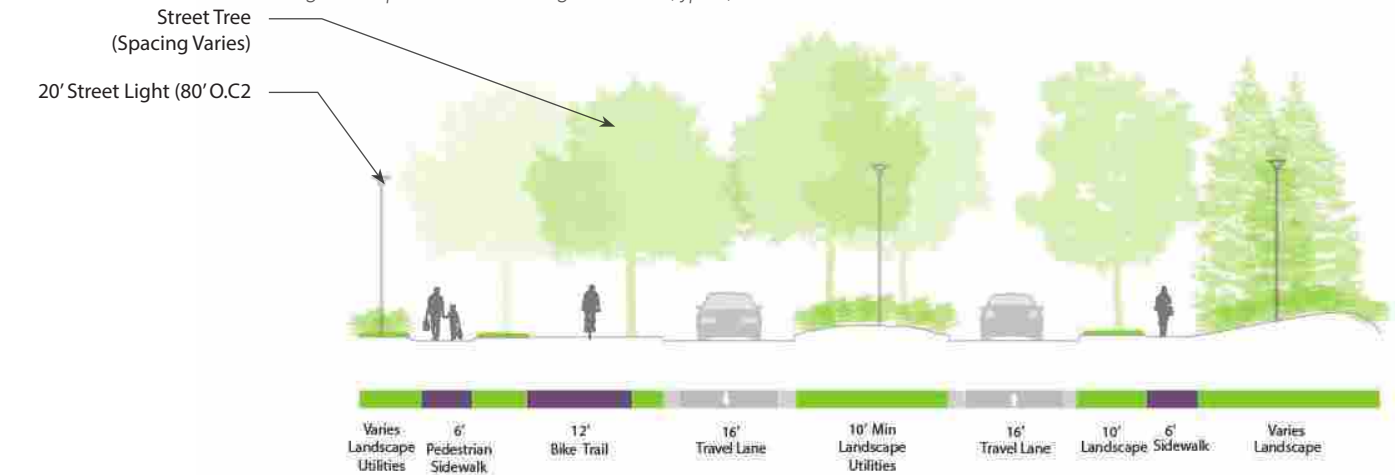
Proposed detail plan of Ridgedale Drive (typical)
